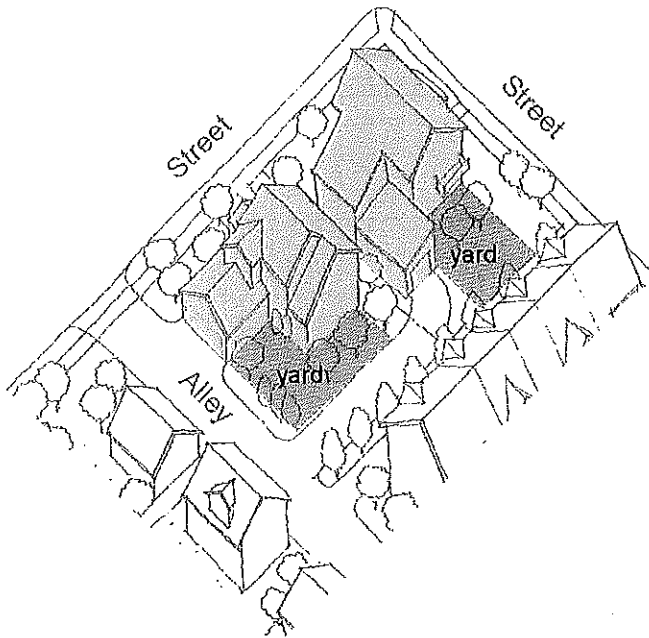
Private yard space must be provided for all detached single-family dwellings.
